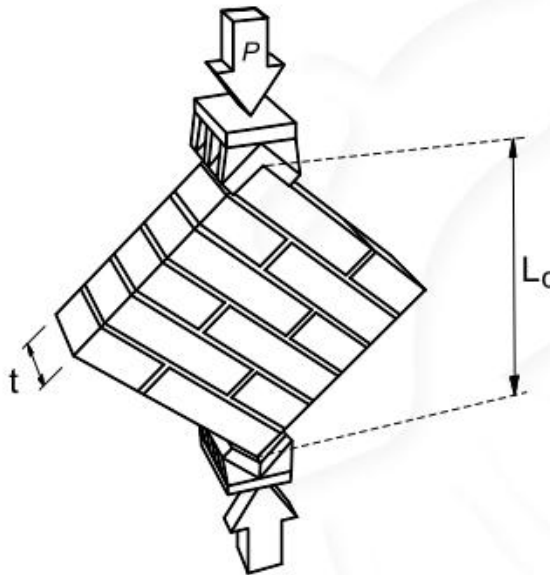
Position of the retaining wall test. NMX-C-464-ONNCCE-2010 (ONNCCE, 2011)
